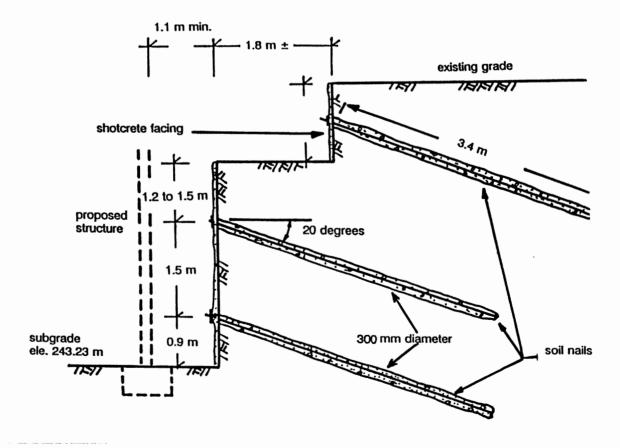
Cross section of a soil-nailed excavation for a building constructed in Santa Cruz (UCSC wall), Calif. (Felio and others, 1990).
